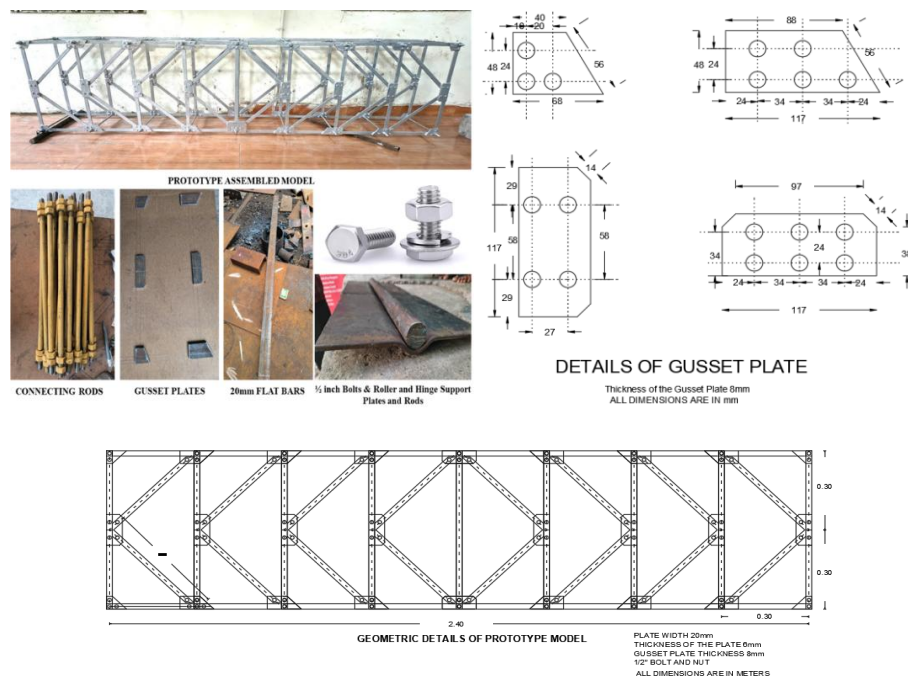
(a) Geometric configuration of the prototype K-truss model. (b) Connection detail with gusset plate and bolted assembly.
